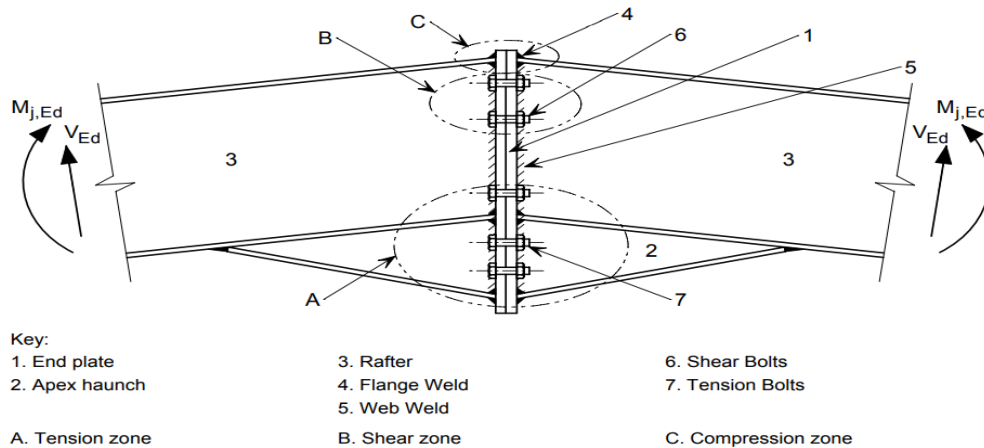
Portal frame apex connection with bolted extended end plate (NCCI, 2008)
